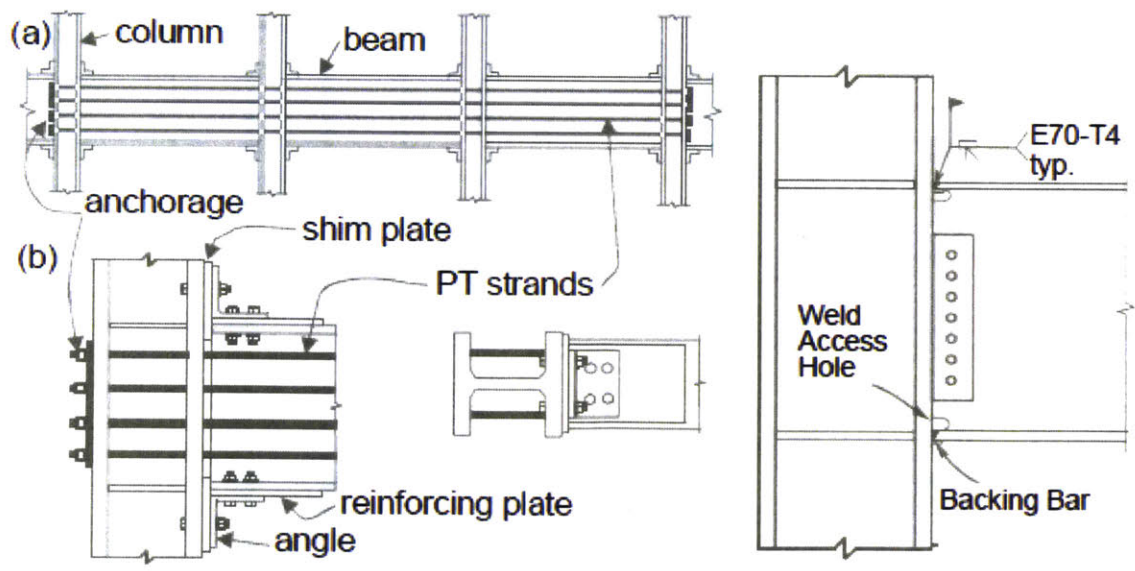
(A) SC-MRF ONE LEVEL ELEVATION (B) CONNECTION AT EXTERIOR COLUMN (HERNING ET AL. 2009)
